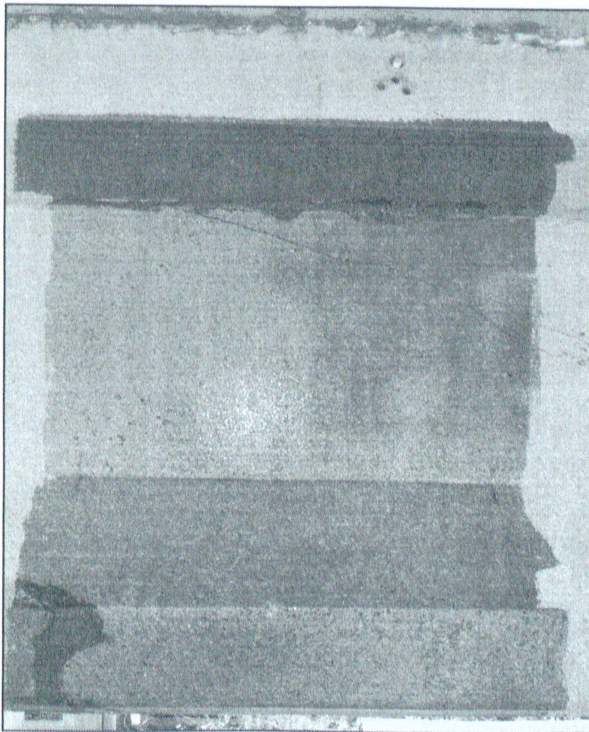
Saturant and Tack Coat Epoxy application on a girder section
